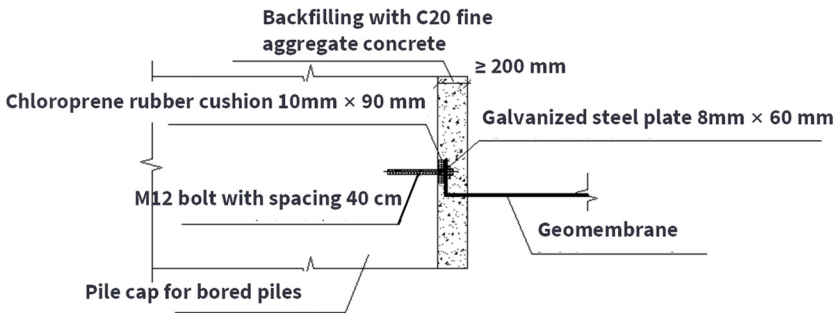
Detailed diagram of the connection between geomembrane and tower foundation
